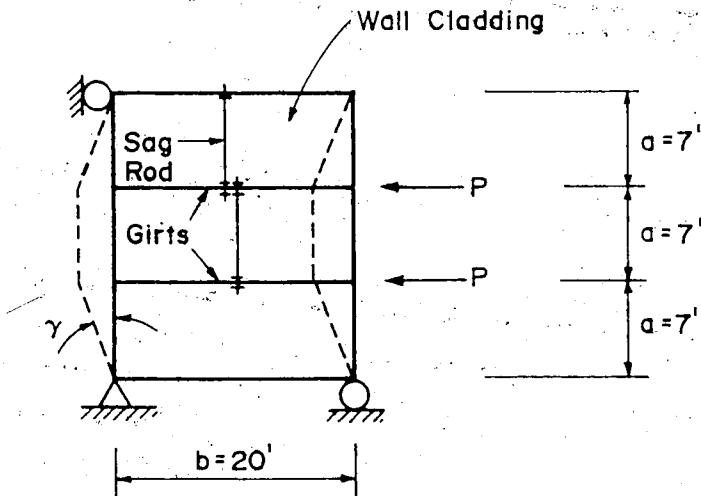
SHEAR TEST ON WALL PANEL
